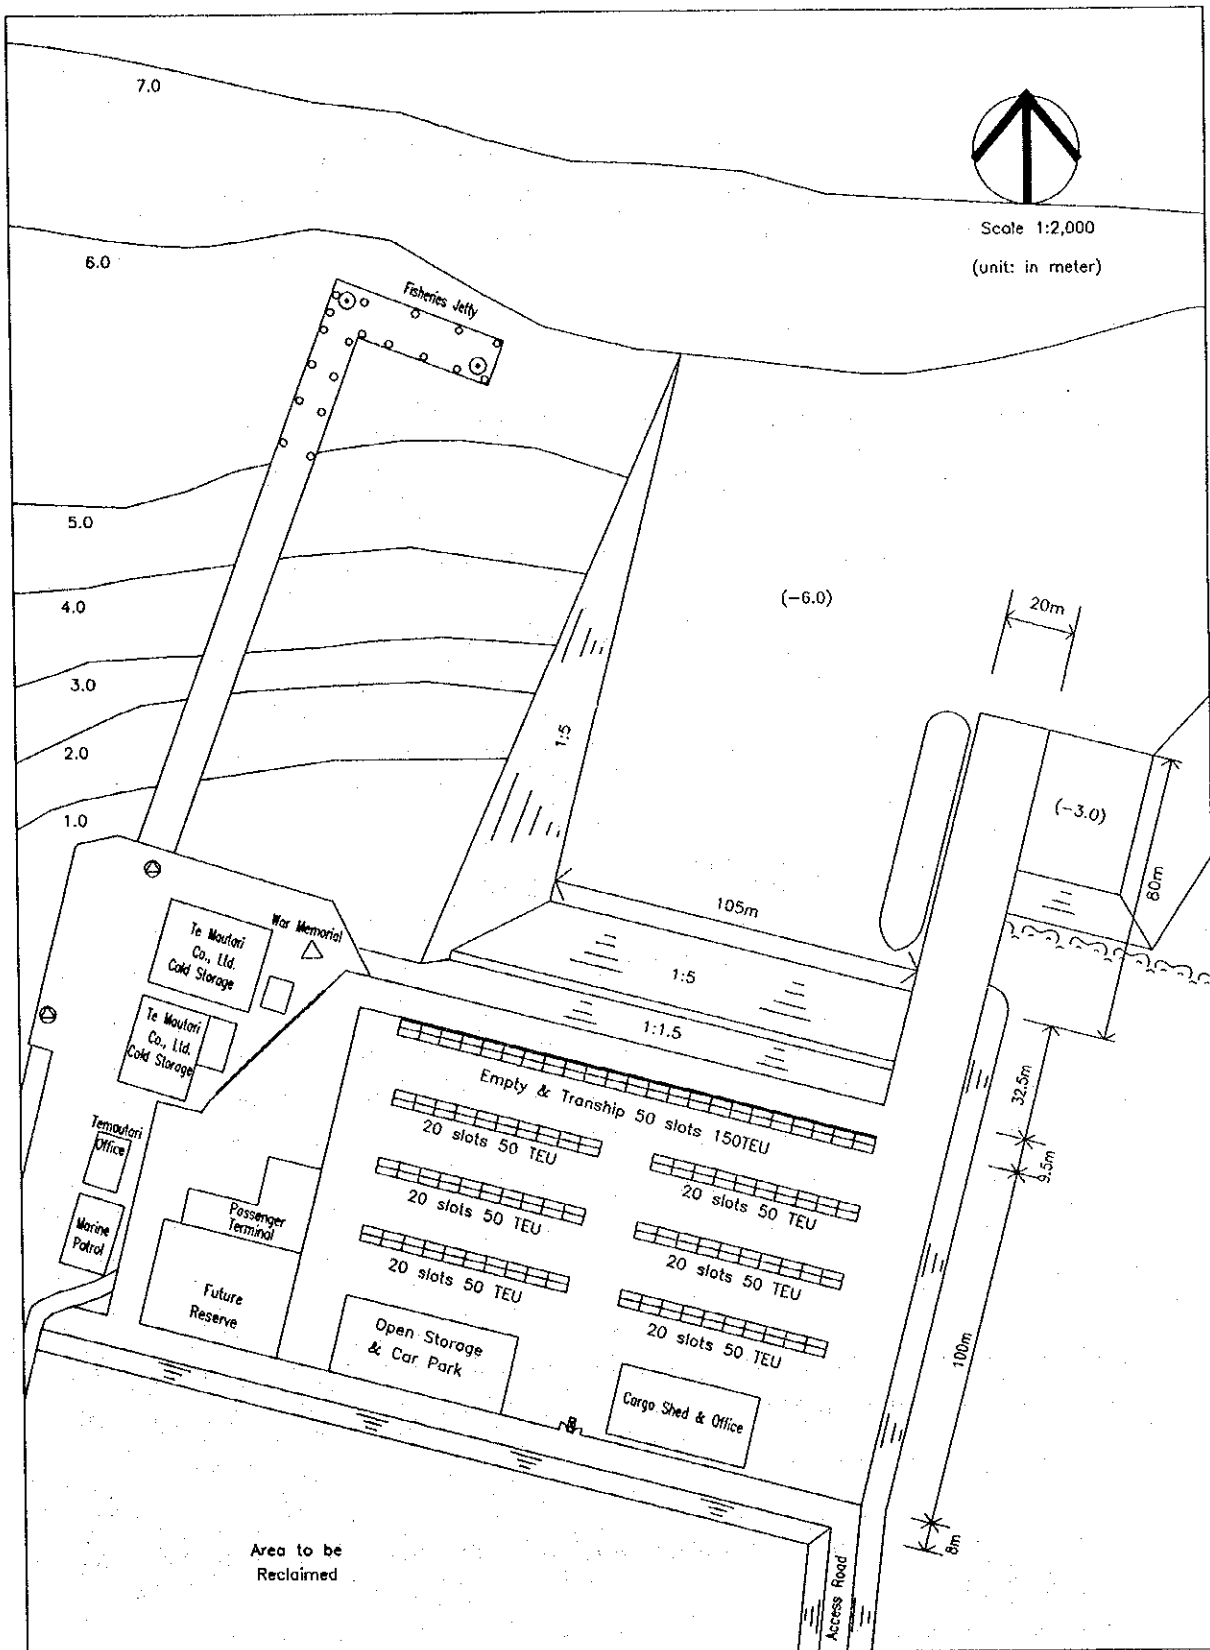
(2) Proposed Container Yard Layout Plan
